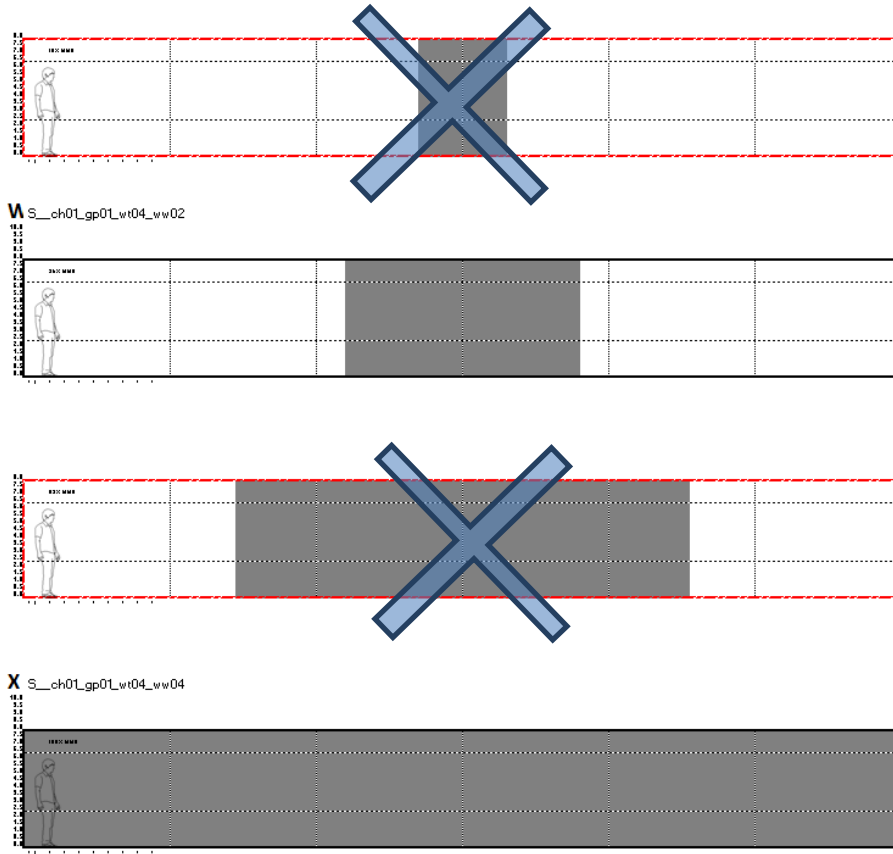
Curtain Wall: 8ft ceiling Ht, 0ft head - ceiling ht, 10%-26%-52% WWRs
